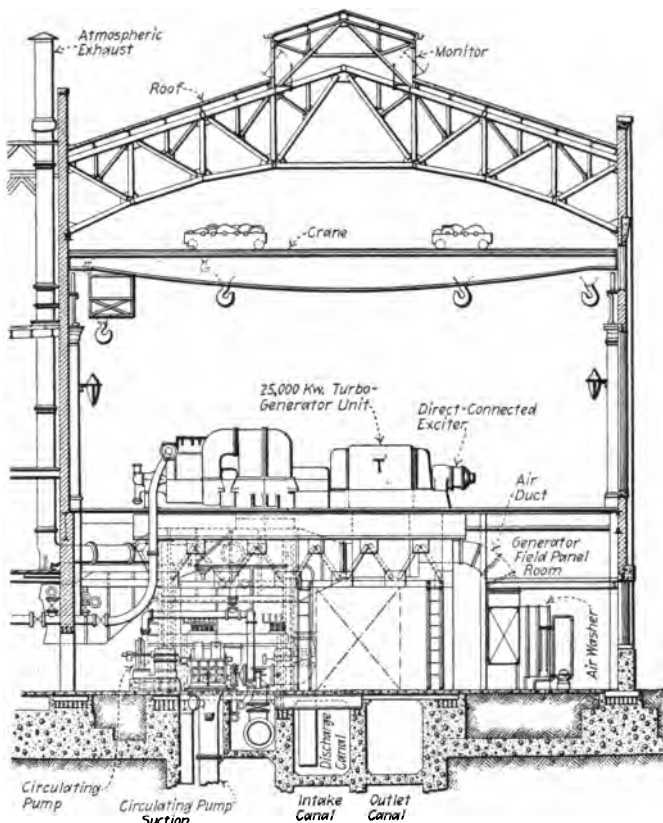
Sectional elevation of the turbine building of the Essex Station.
